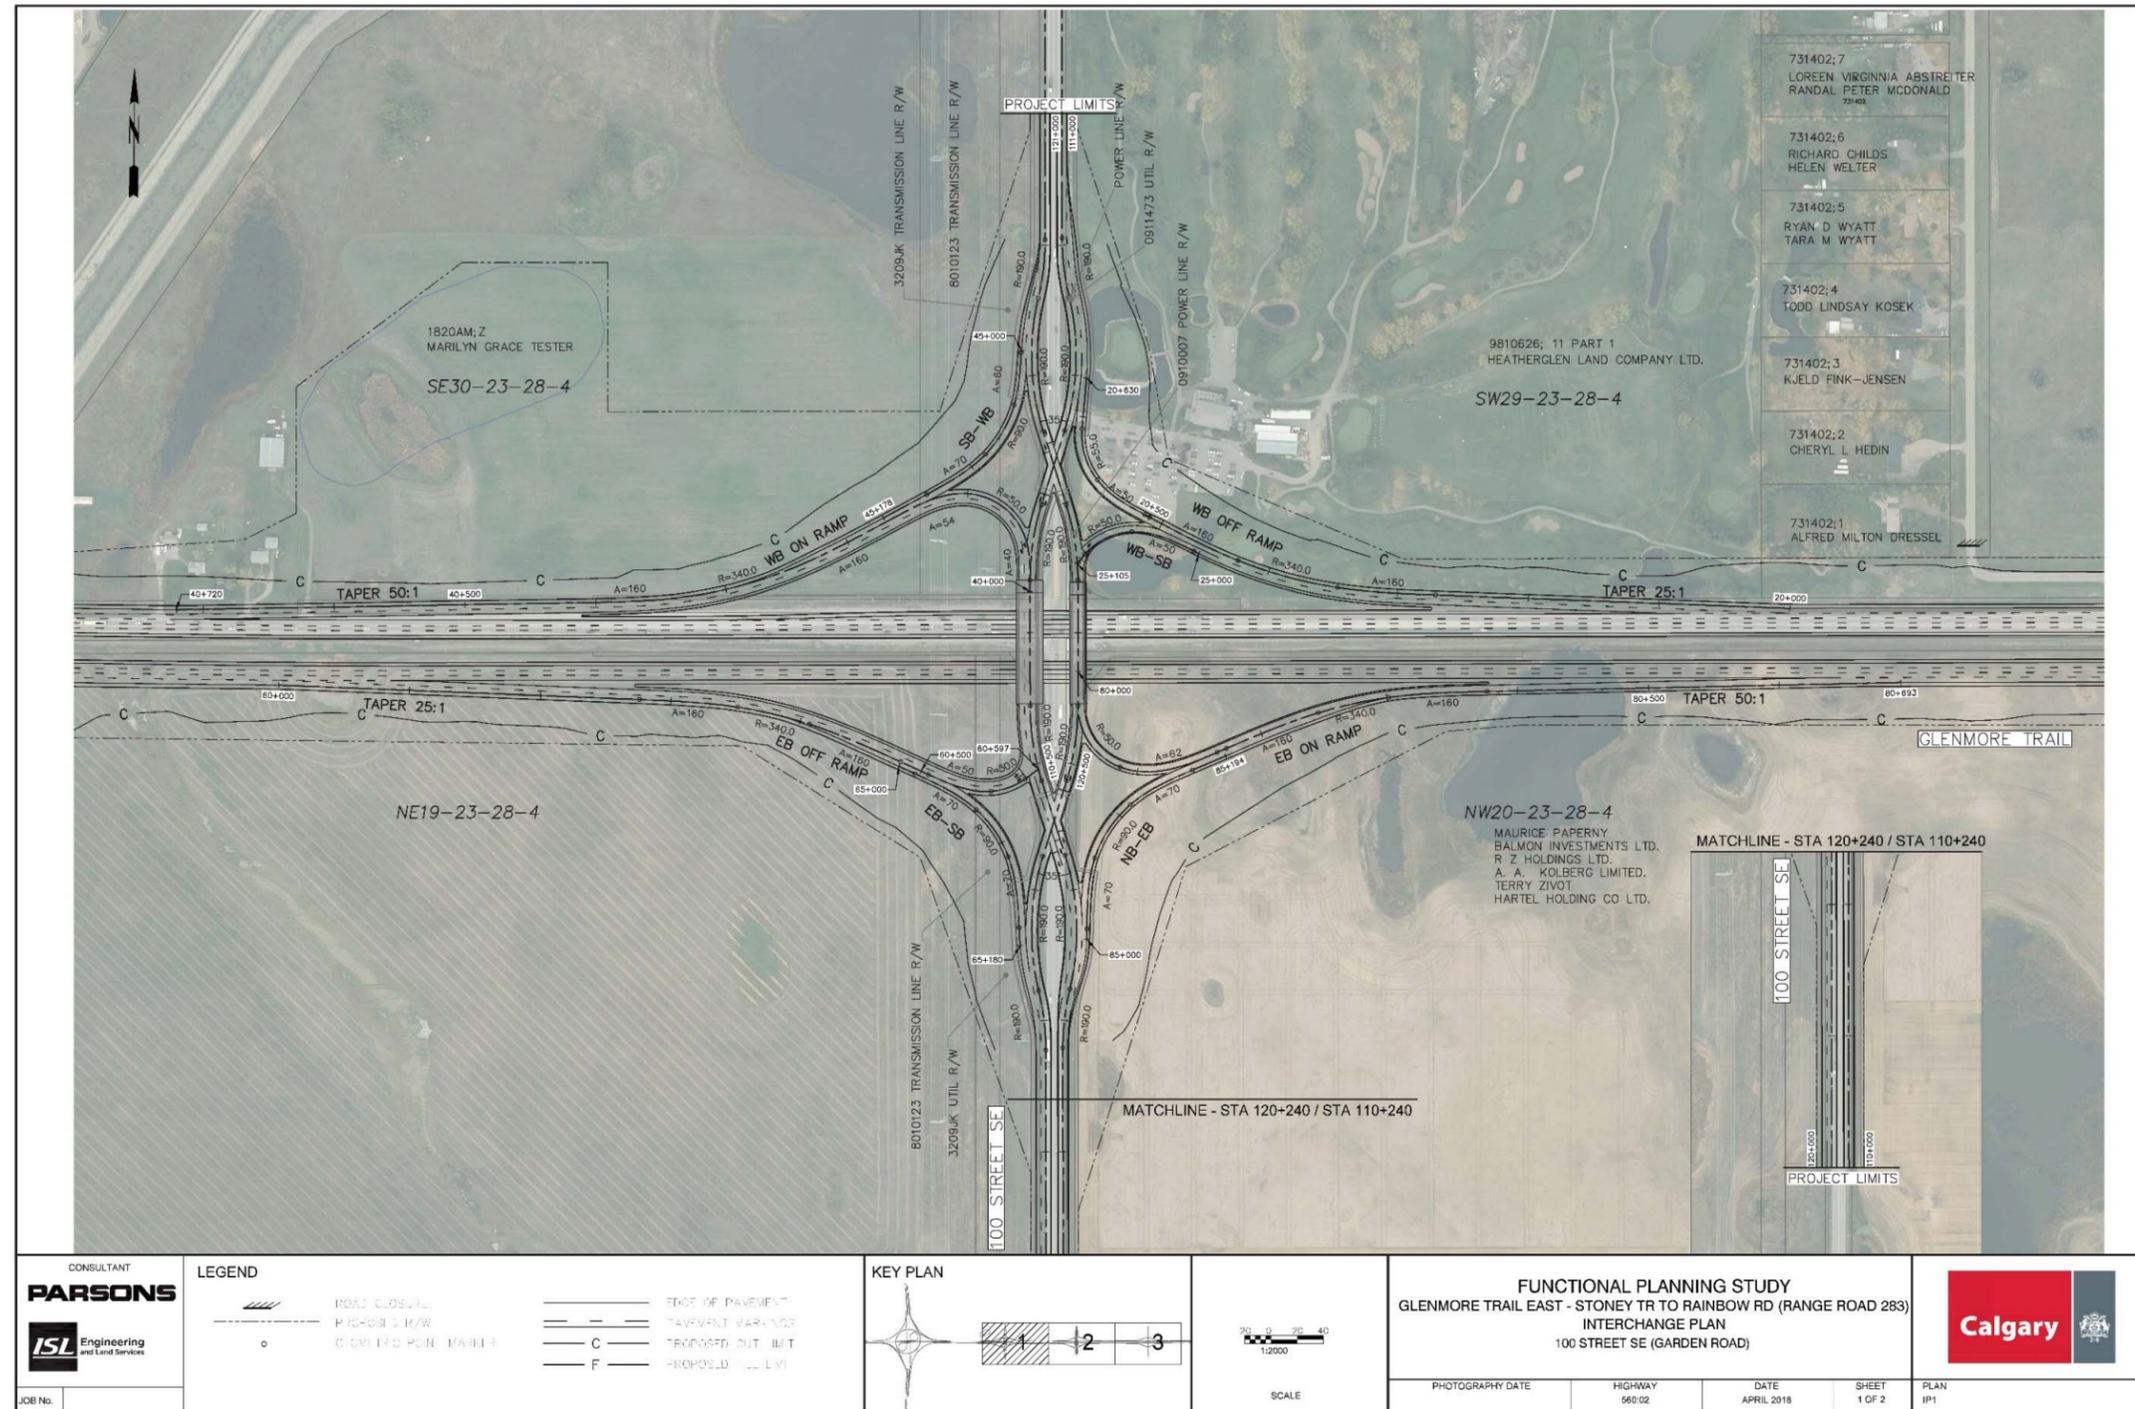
RECOMMENDED PLAN - 100 ST SE
